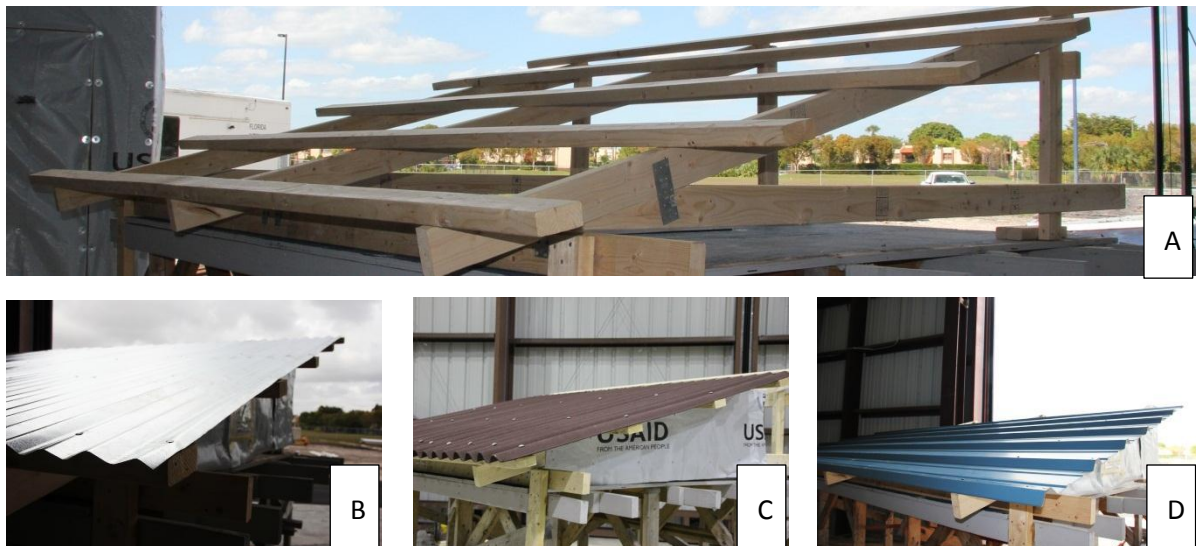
(A) Roof framing, (B) 32-gauge CGI roofing, (C) cellulose-bitumen roofing and (D) Structural PBR roofing
